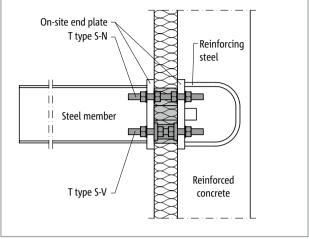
Schöck Isokorb® T Type S-N and T type S-V modules for connection of steel structure to reinforced concrete frame
